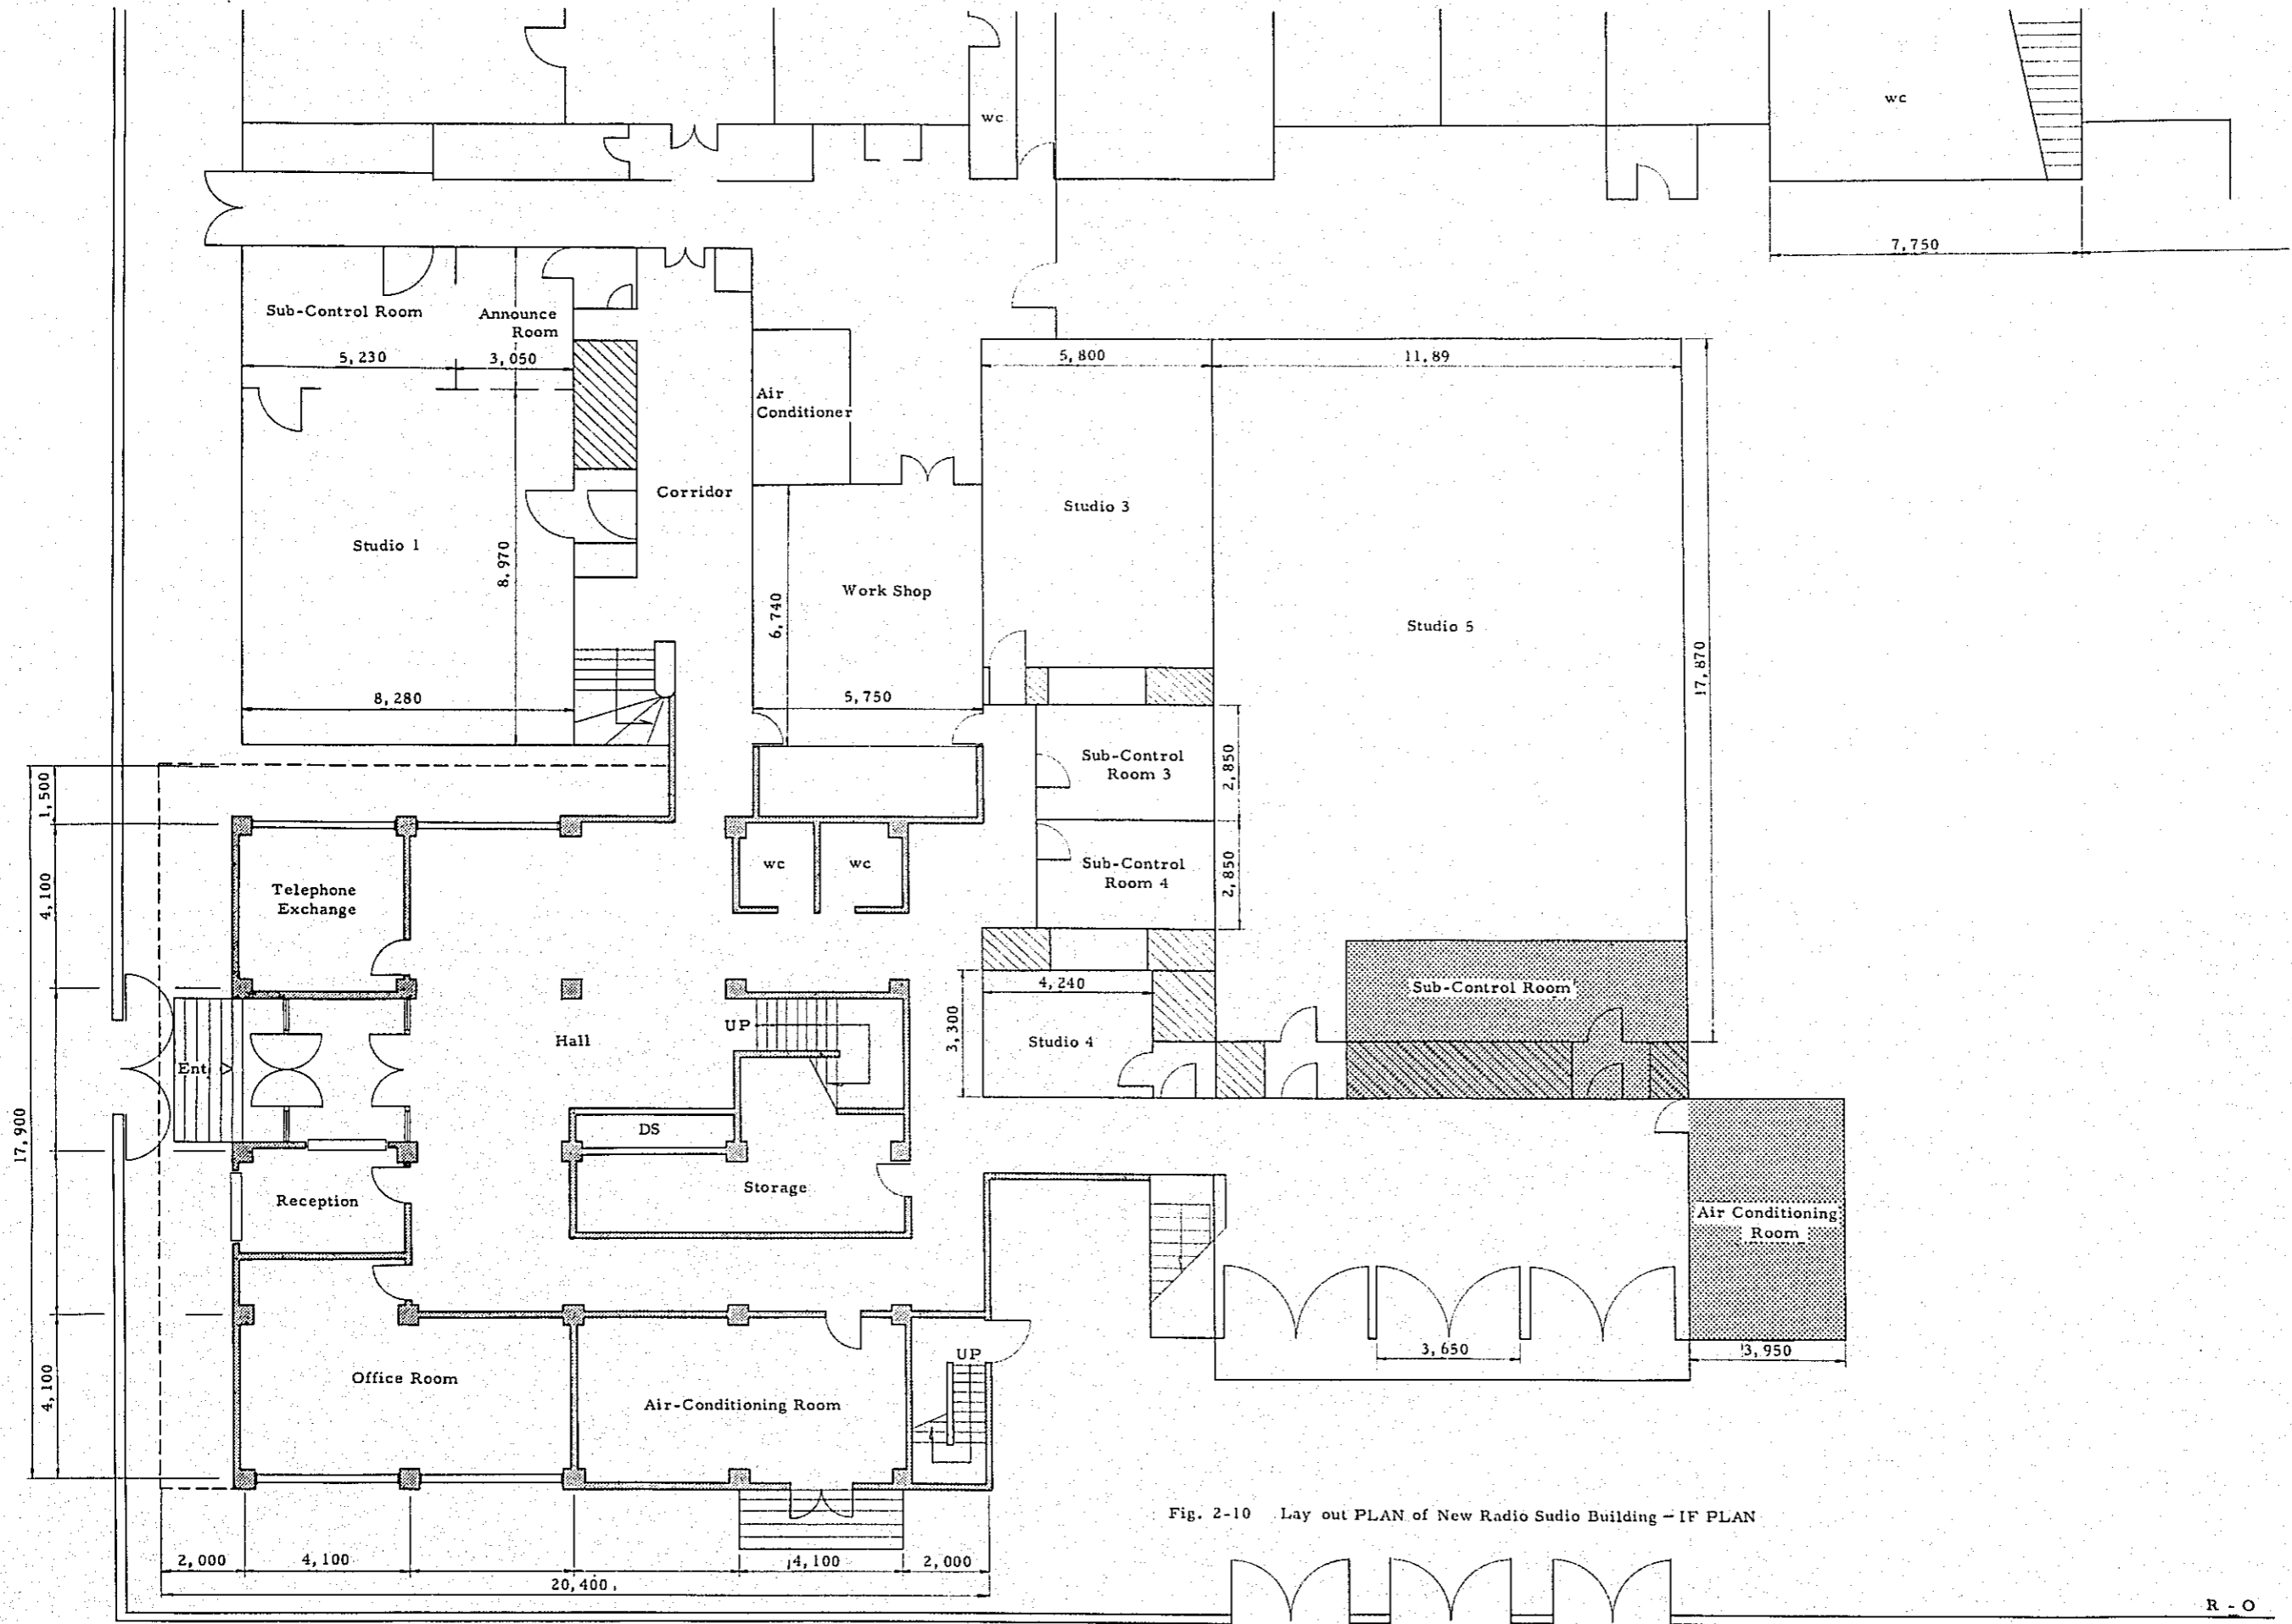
Lay out PLAN of New Radio Studio Building - IF PLAN
